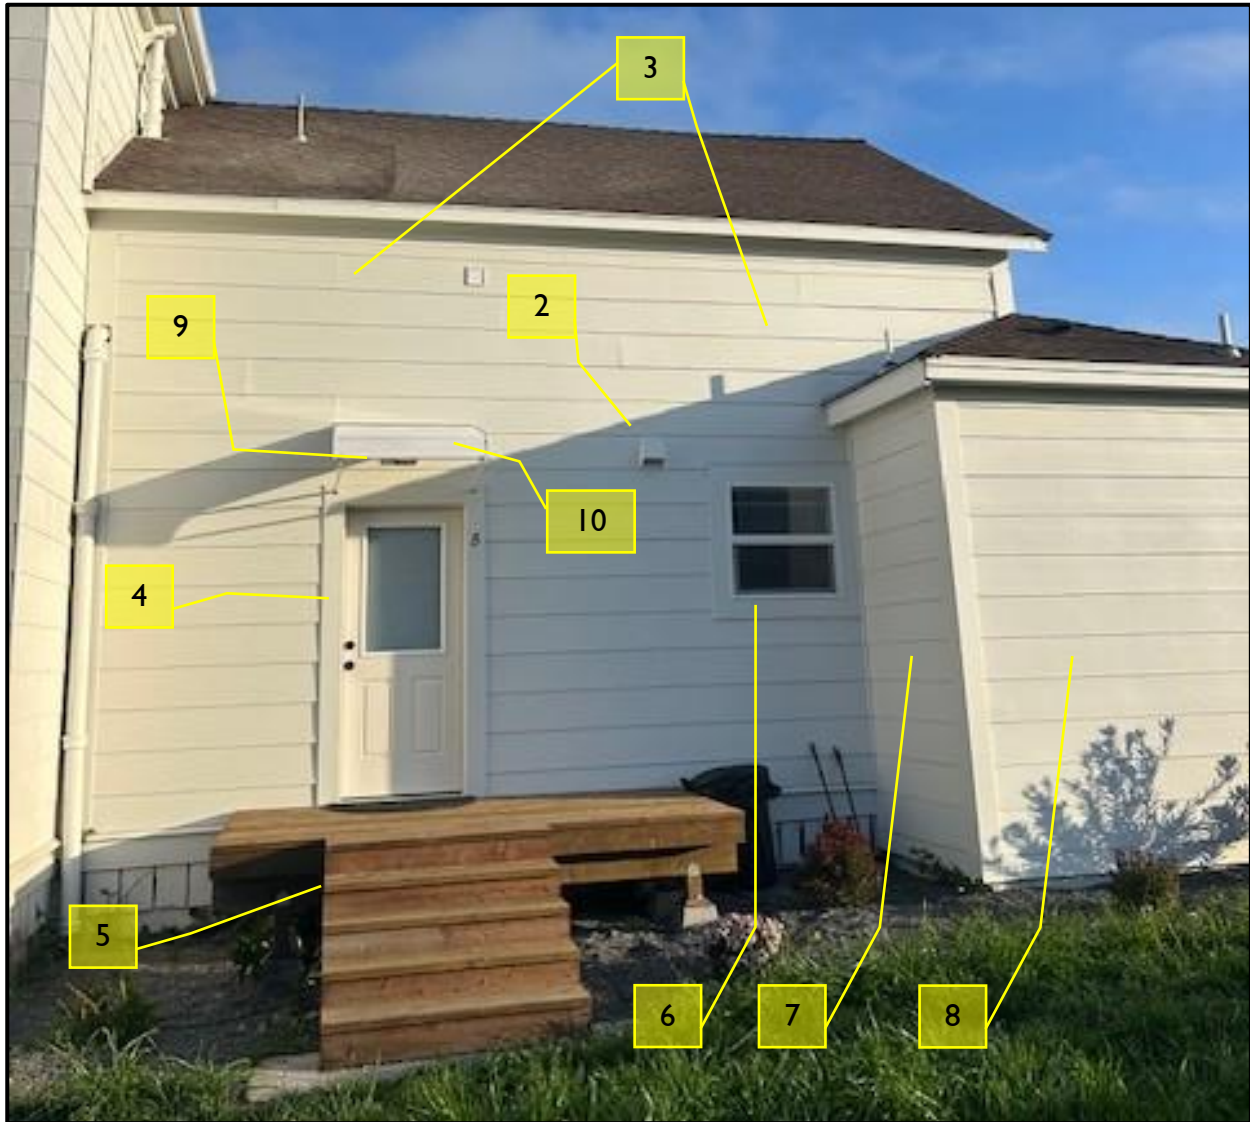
Church Street Façade, Post-Rehabilitation, 2025.
